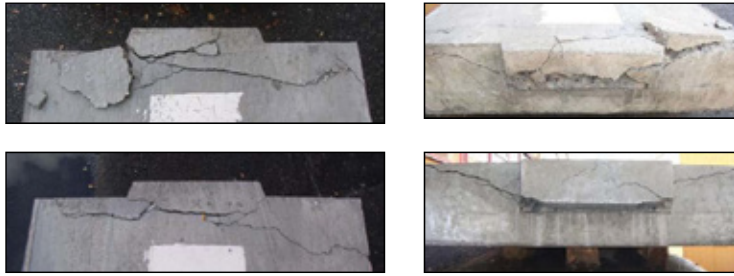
Photos of shear key type 1 with a failure activating the reinforcement.
